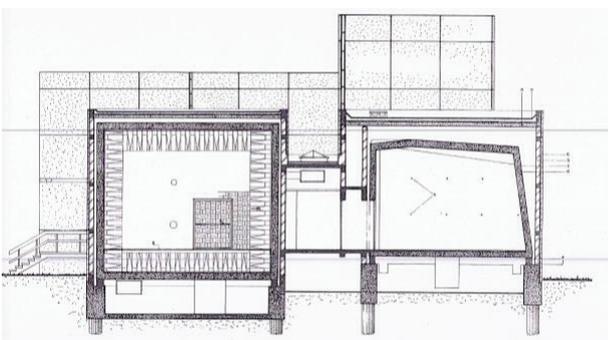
Cross-section of the laboratory, anechoic and reverberant room (1967)
